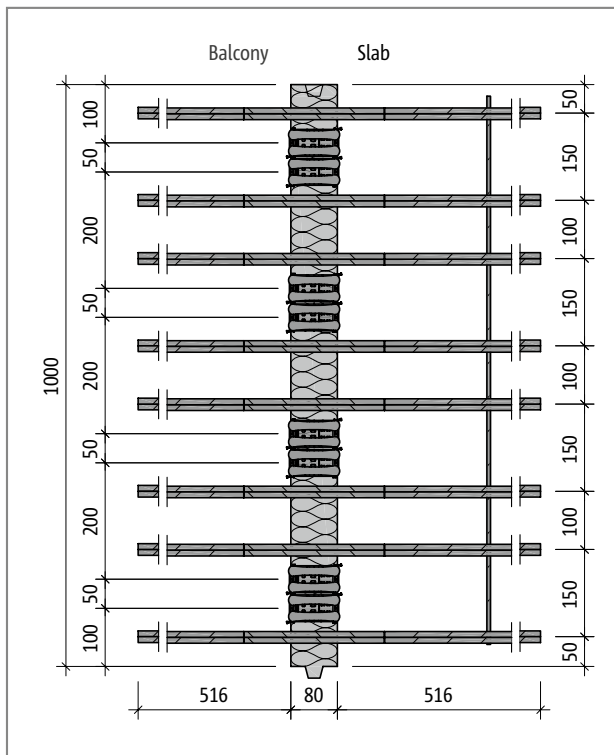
Schöck Isokorb® T type Q-E-VV5: Product layout
